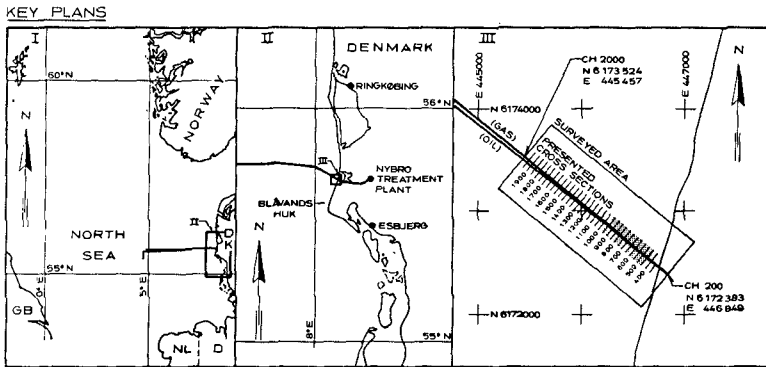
Key plans of the North Sea Shore Approach Site.
